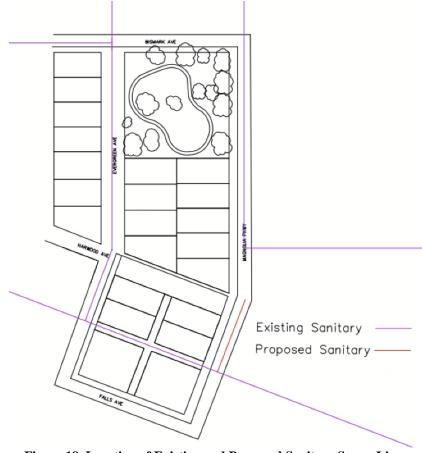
Location of Existing and Proposed Sanitary Sewer Lines
